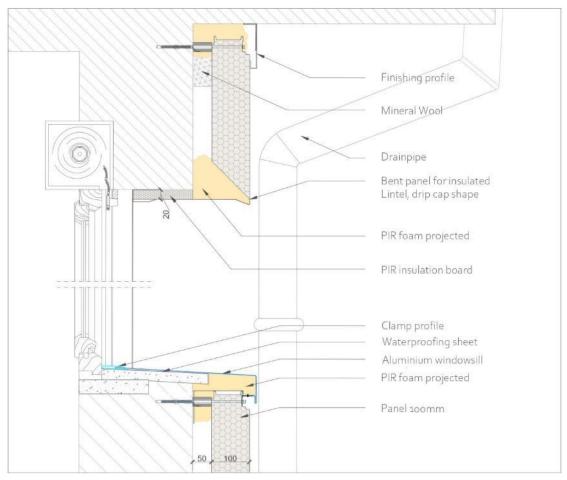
Window detail drawing (vertical) [drawing created using AutoCAD]
